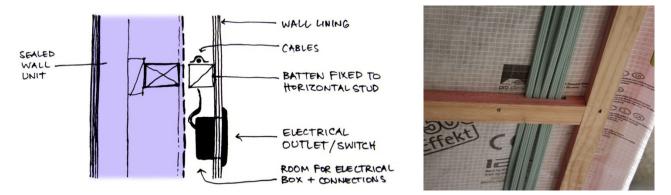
An interior cavity means electrical cabling and outlets do not penetrate the airtight wall structure
